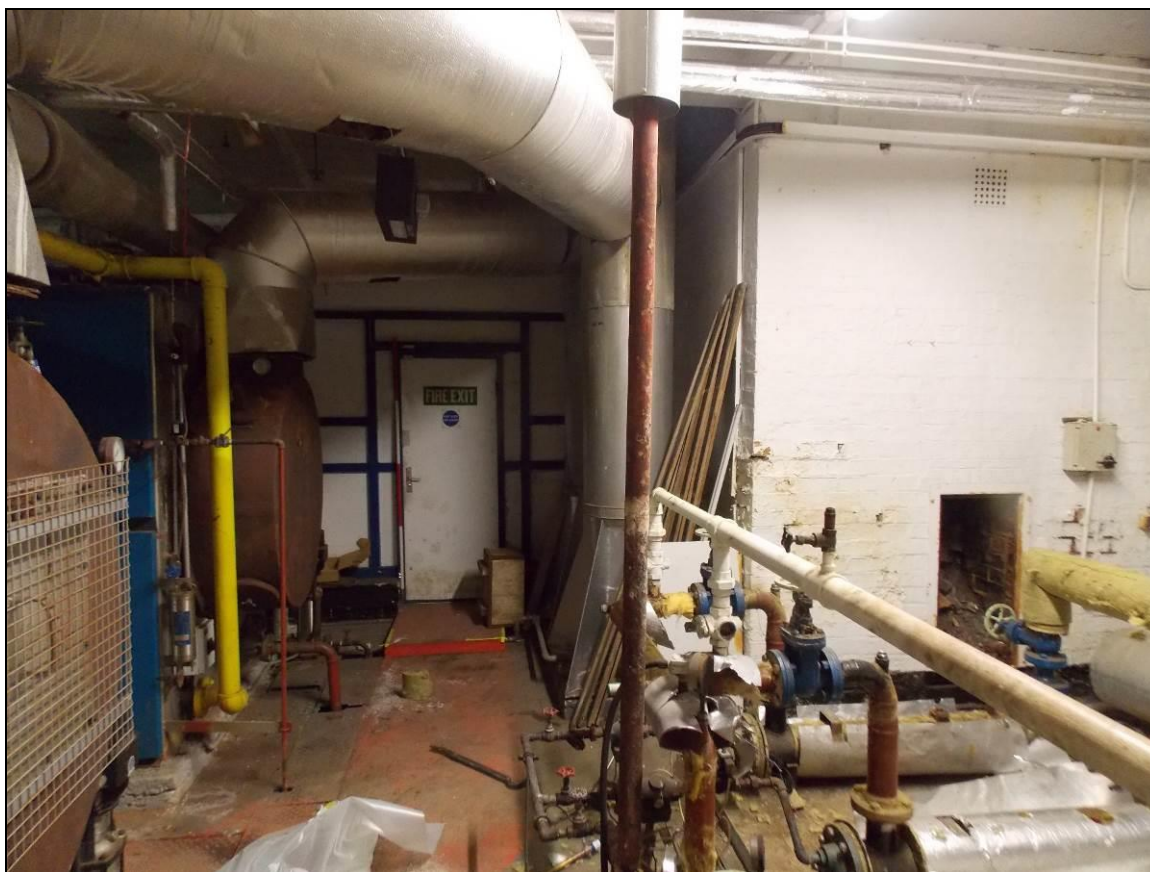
Inserted fire exit within the southern wall, looking south (scale 2m).
